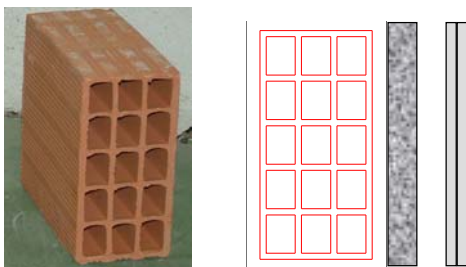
The hollow brick for the masonry of wall A (left) and the whole wall (right).
